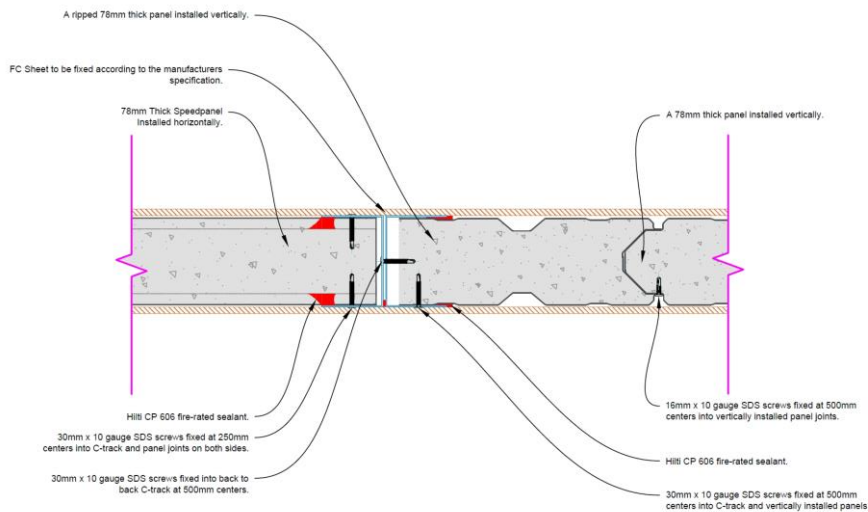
Joint between Vertical and horizontal Speedpanel walls lined with 6mm Fibre Cement sheets.
